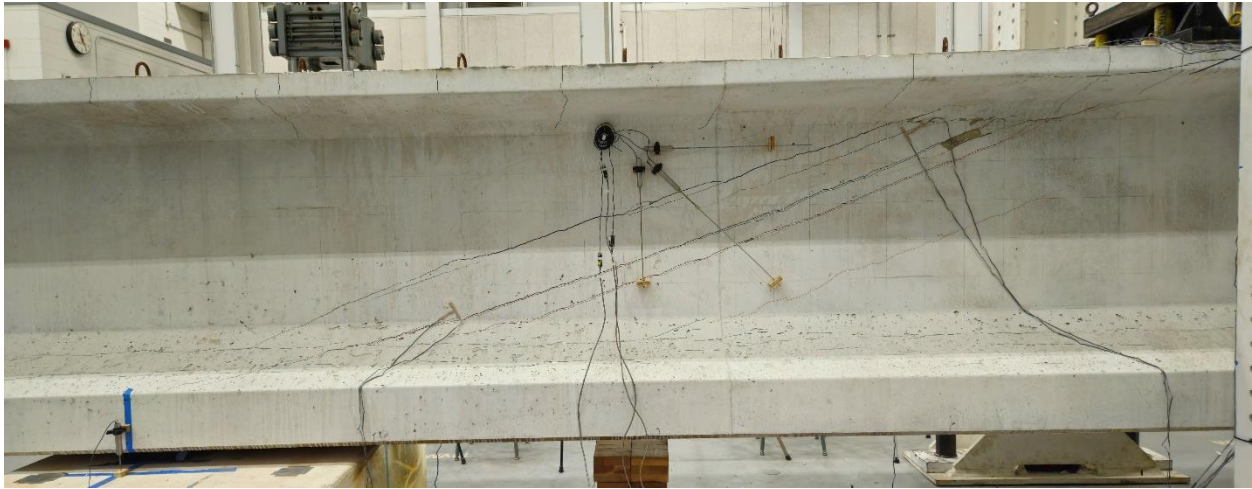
West side of G8 girder at cracking load.
